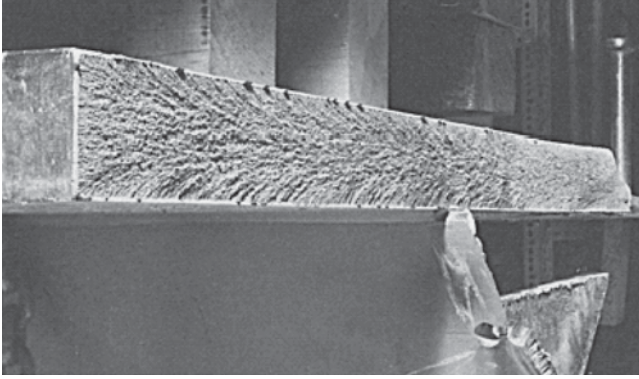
Brittle fracture of flange of tub girder of Bryte Bend Bridge in Sacramento, California, while under construction.
